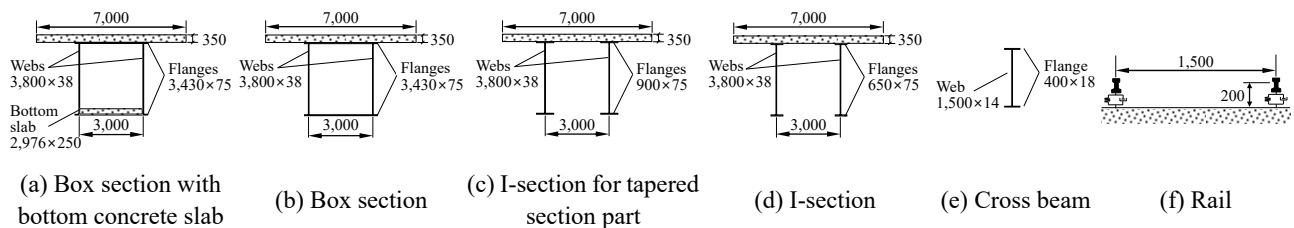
Dimensions of cross-sections for an assumed complex partial girder for railway bridge (Unit: mm)
